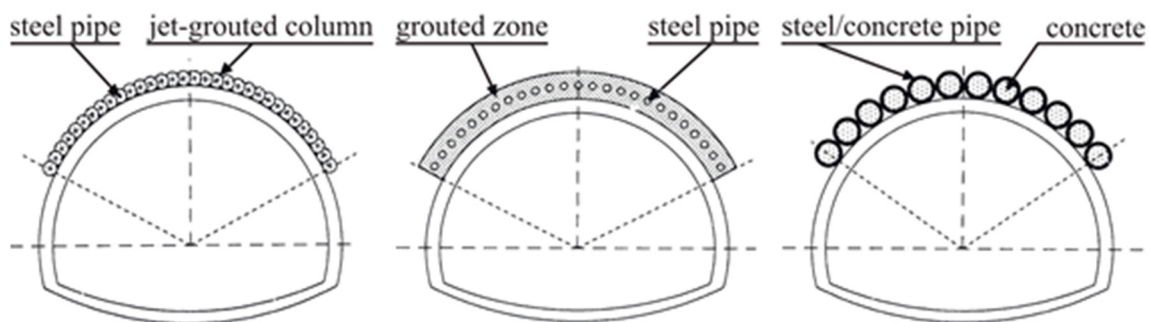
Umbrella types defined by Muraki (1997): from left to right; reinforced sub-horizontal jet-grouting method, injected steel pipe umbrella method and pipe roof method
